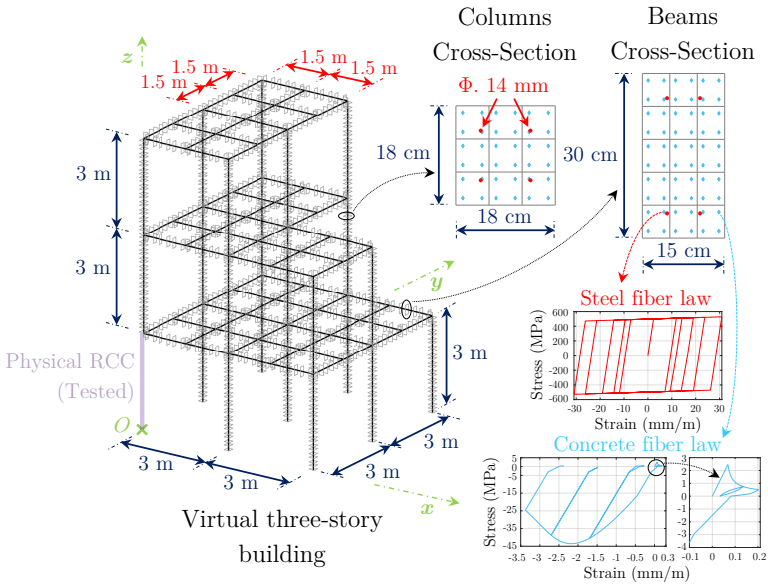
Virtual three-story structure. (left) Discretized multifiber beam model with cross-sections at Gauss points (upper right) mesh of the cross-sections (lower right) steel and concrete constitutive laws.
